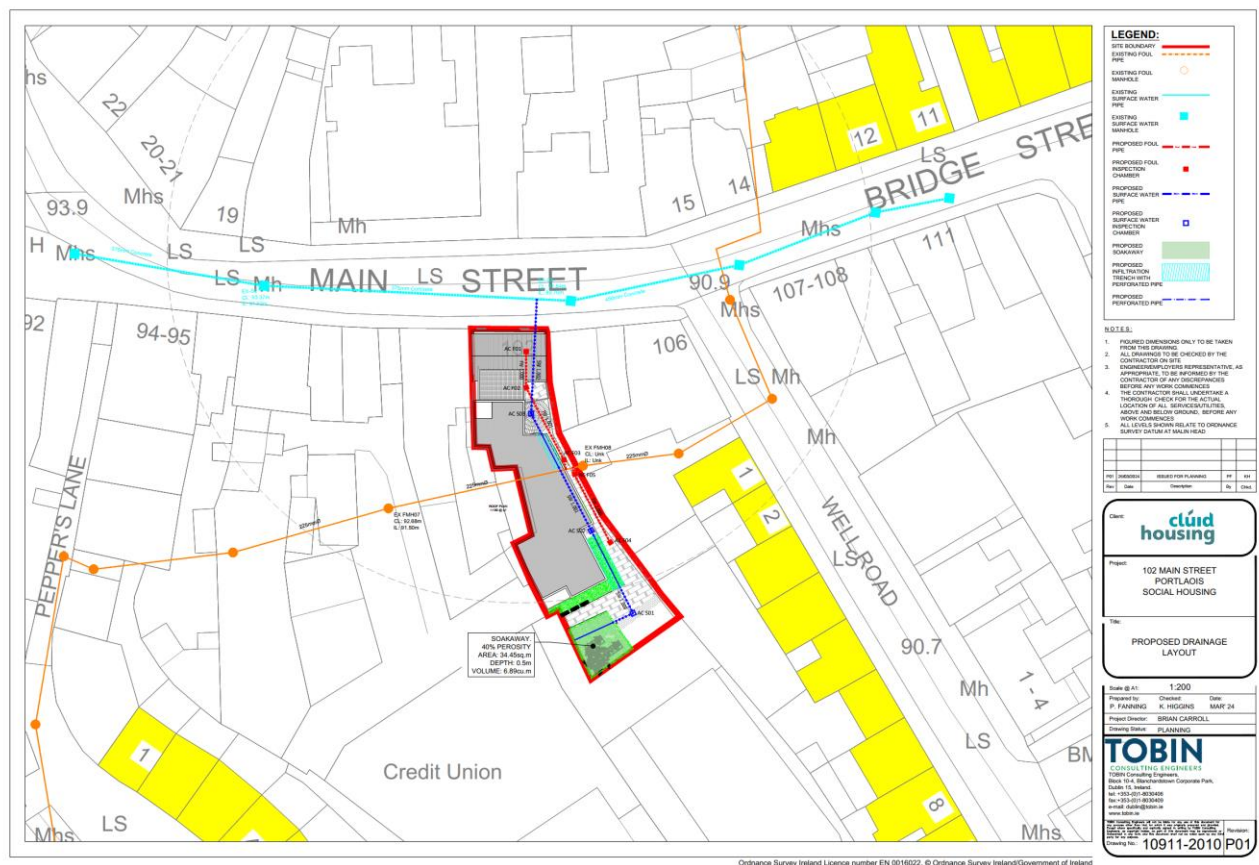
Proposed Drainage Layout, drawing 10911-2010
